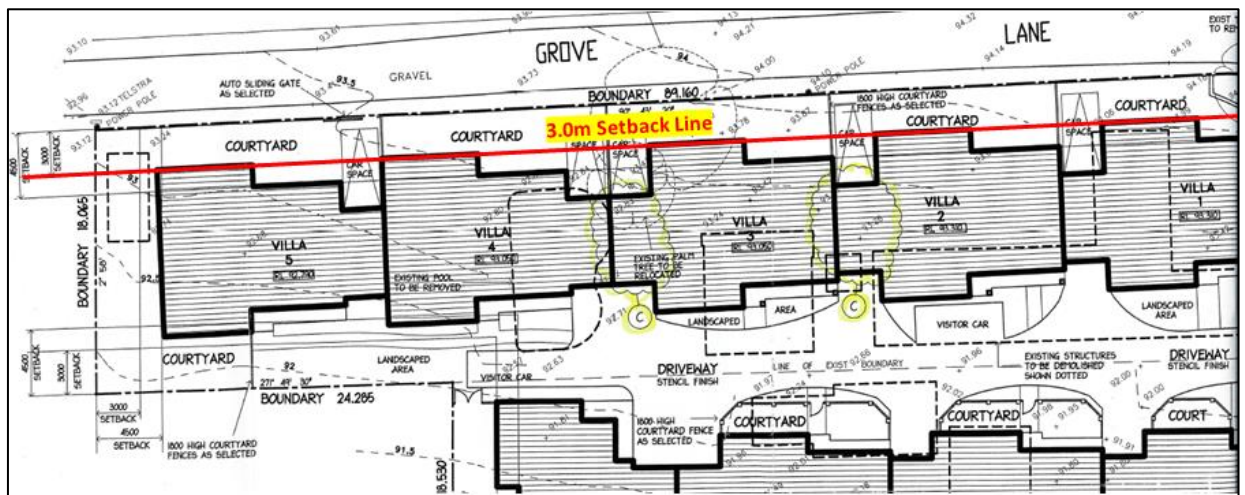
Approved site Plan for multi dwelling development at 27 – 29 Grove Street (LDA2000/595)
